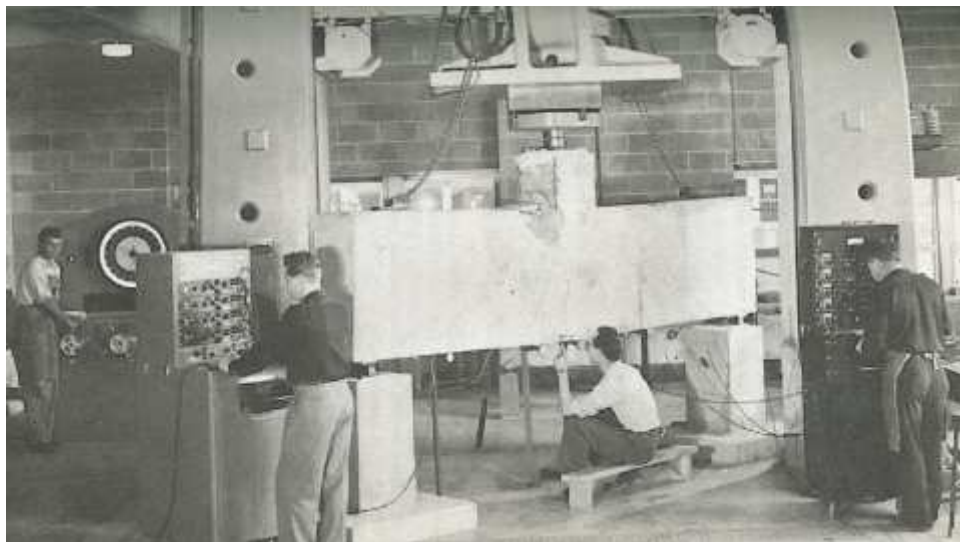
Test setup (Hanson and Reifensuhl 1958)
